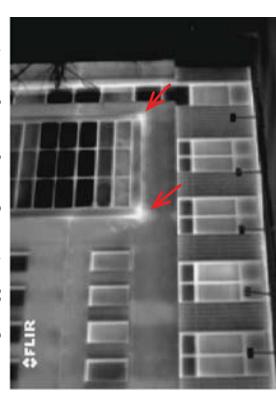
Convective heat loss pattern noted below windows (building under negative pressure).
